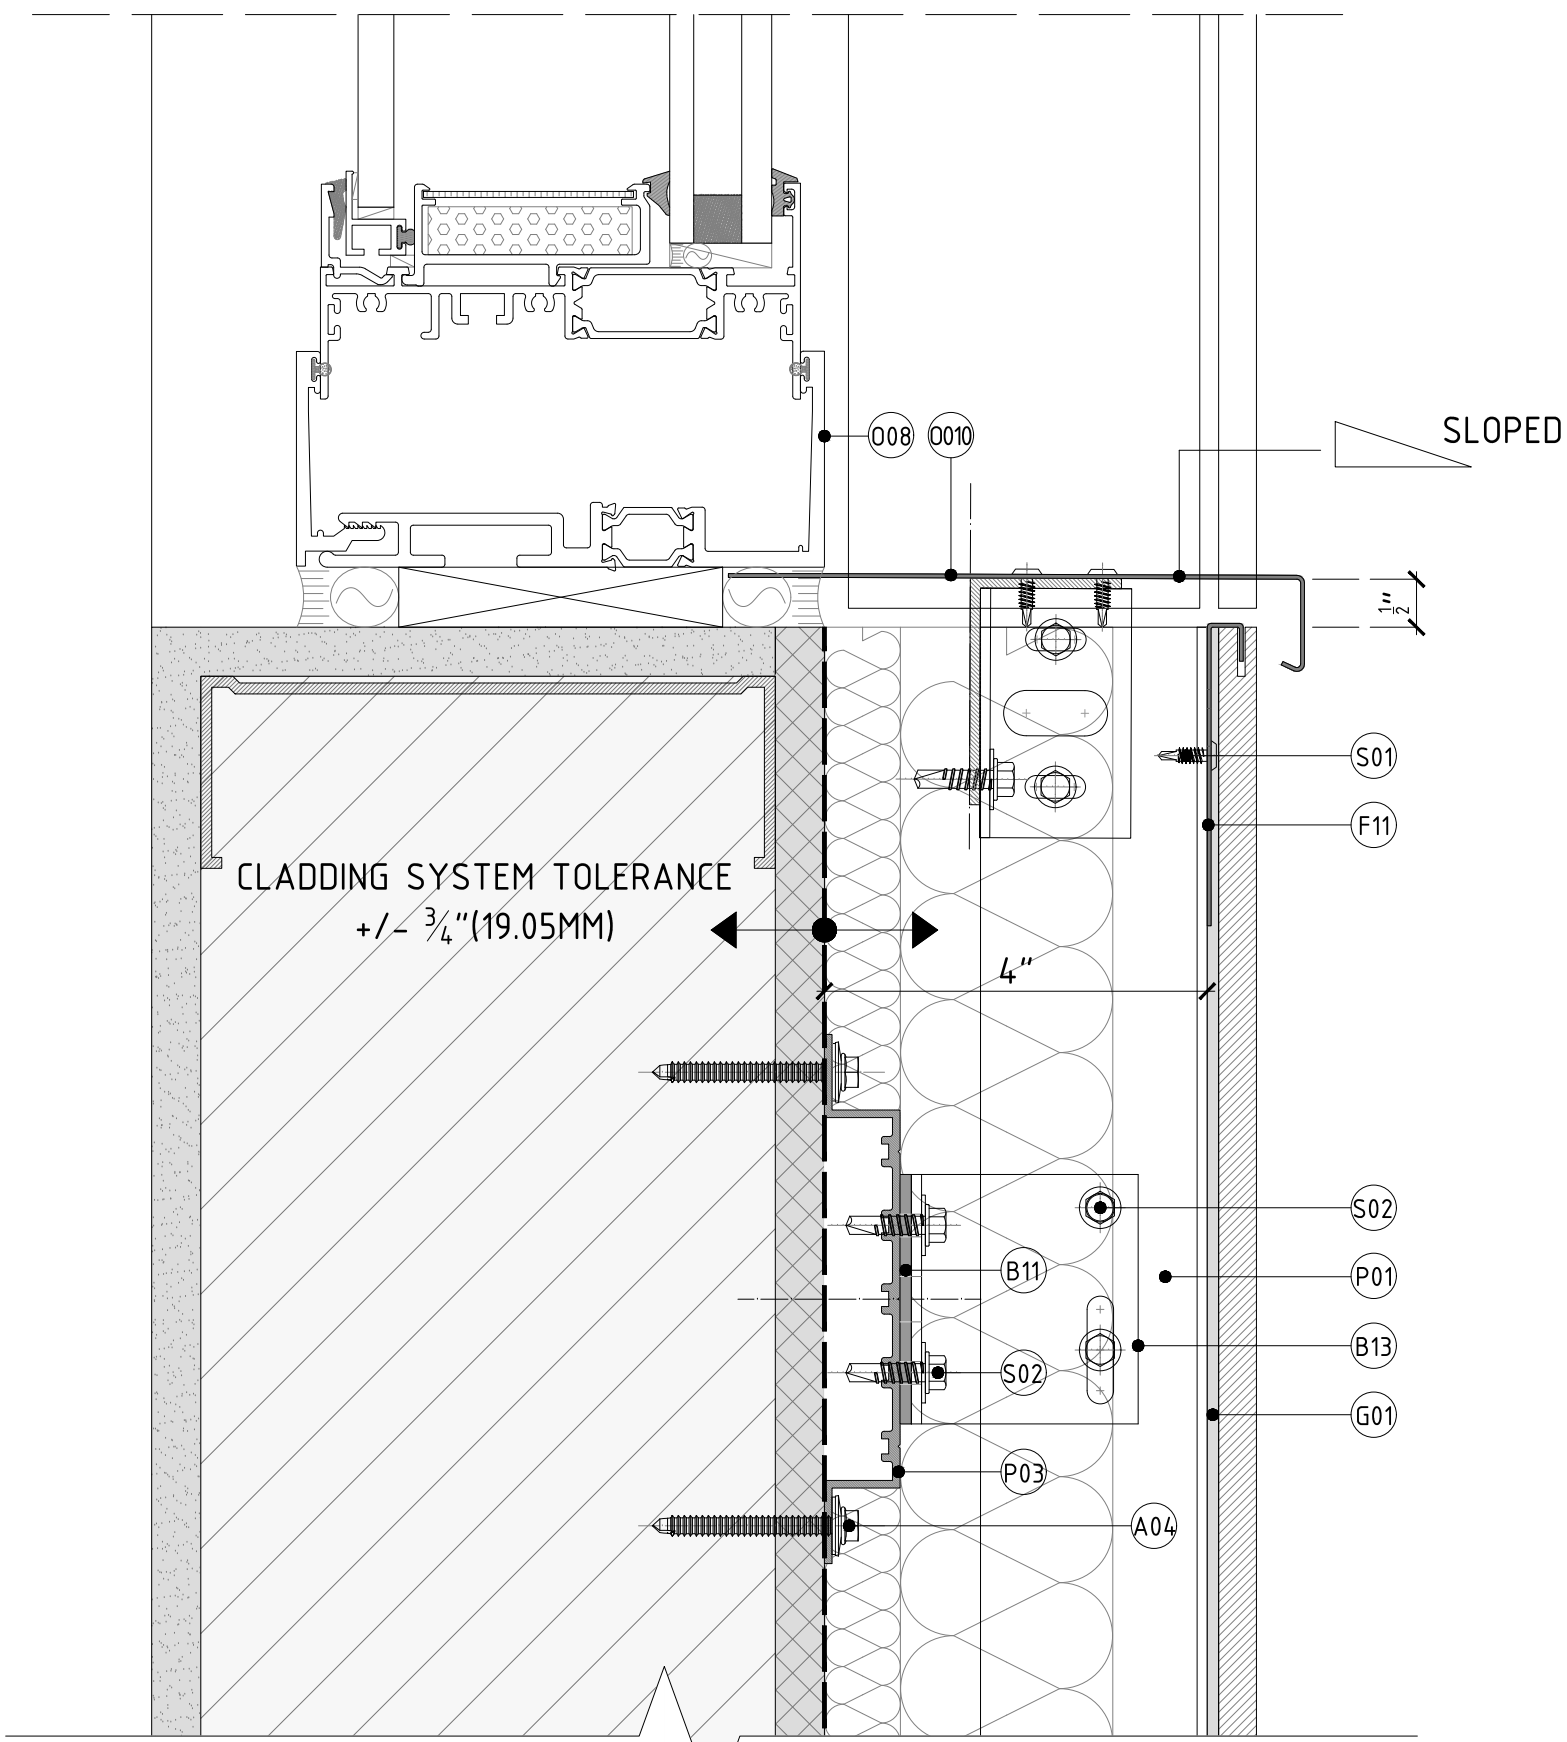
DETAIL B - TYP. METAL JAMB DETAIL - ALTA LIC PROJECT
